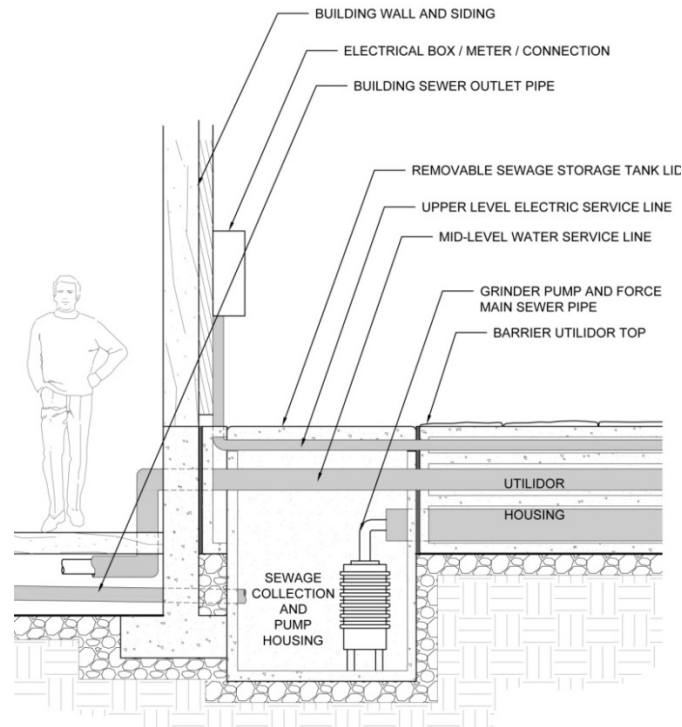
Building connection section detail. Section view of the connection of the barrier utilidor to the existing structure and placement of a grinder pump force main sewer system.
